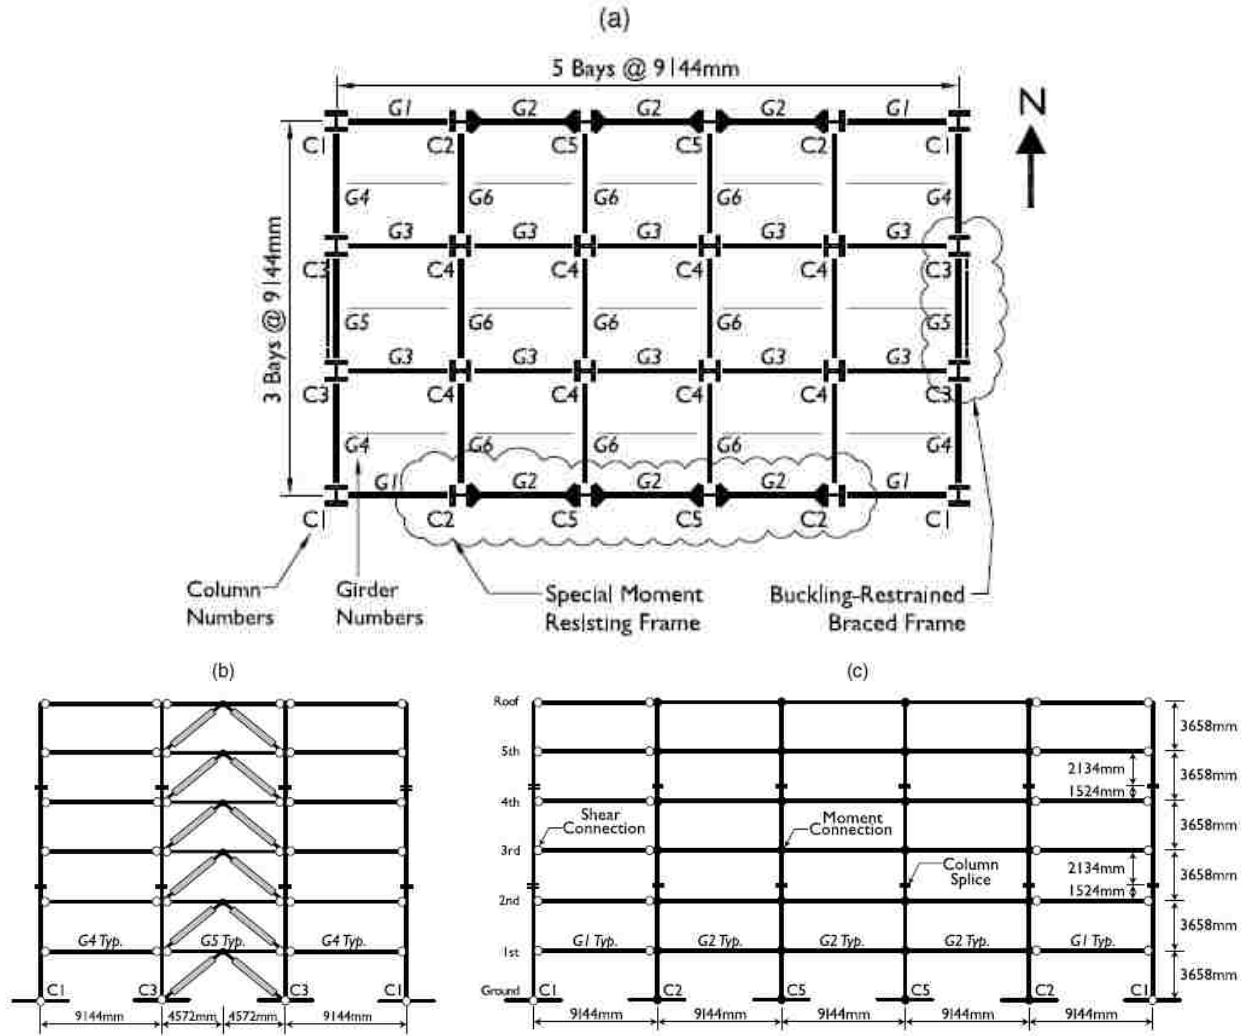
Typical building design: (a) building plan; (b) buckling-restrained braced frame typical north-south elevation; (c) special moment-resisting frame typical east-west elevation [1].
